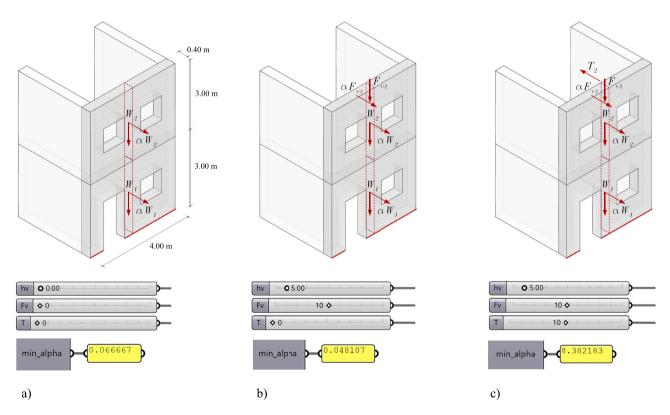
Simple overturning of a multi-story wall: (a) sketch of the collapse mechanism and (b) geometry, boundary, and loading conditions of the mechanical model.
